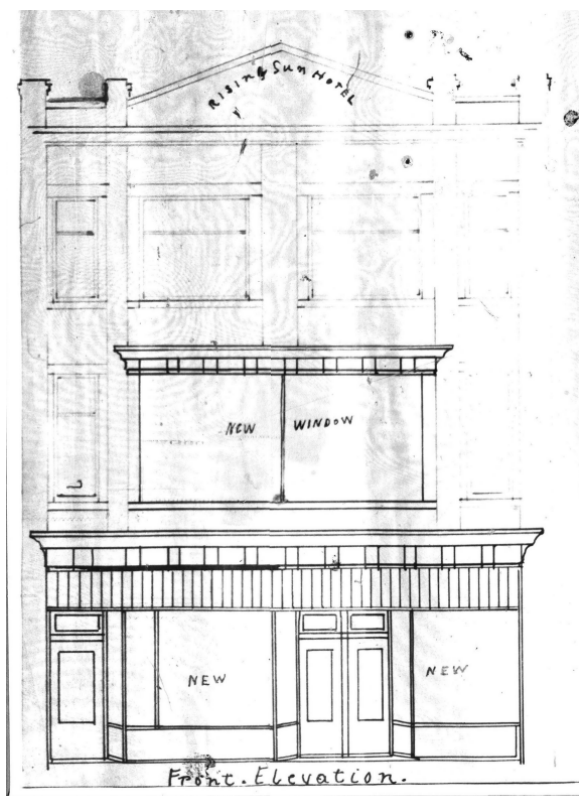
Building Records from 1922 showing the east elevation of 752 Yonge Street.
